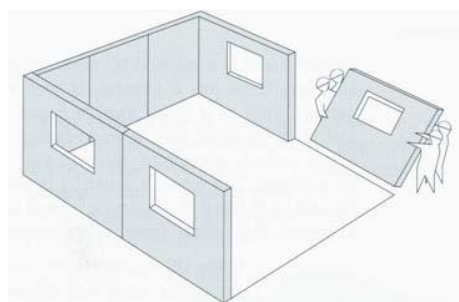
Platform frame construction. Utilising small manufactured panels in kit form for assembly on site [4]
